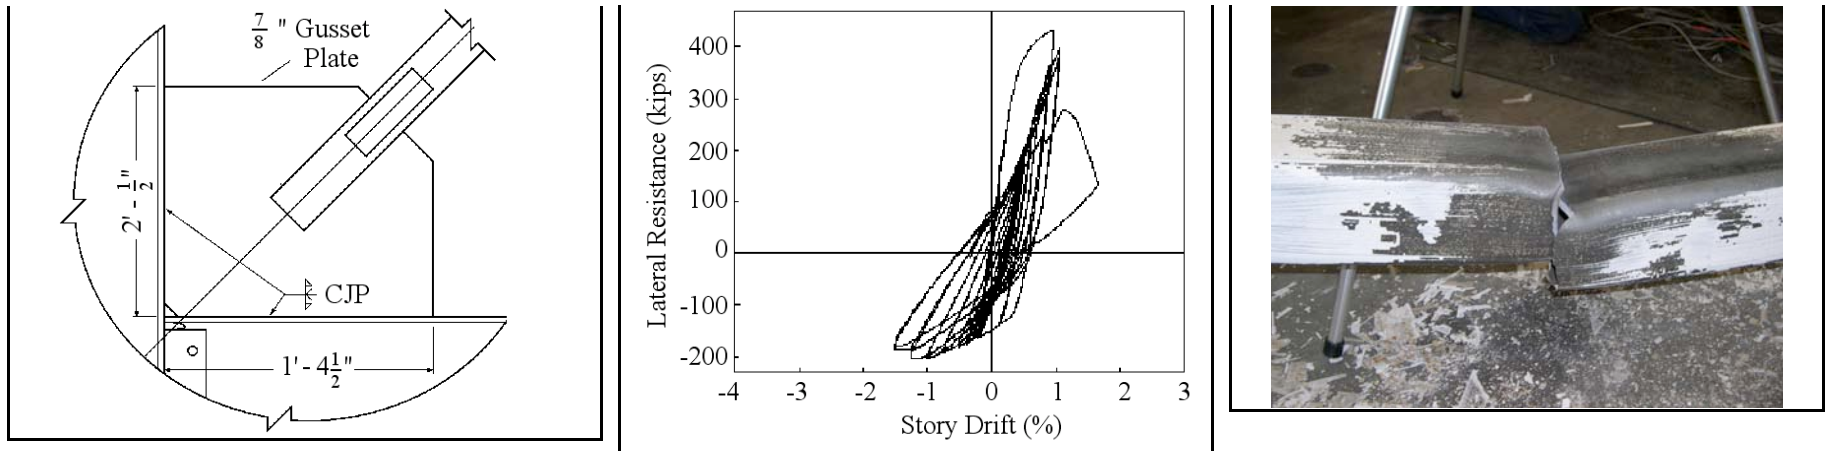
Force-Story Drift of SCBF (Continued); a) Weld fracture due to welds designed by uniform force method, b) SCBF gusset with added constraints noted above, c) SCBF with very conservative gusset plate design
